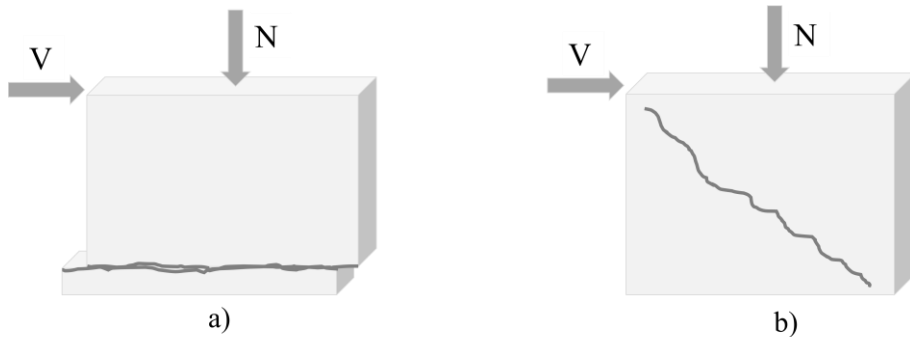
Scheme of shear failure mechanisms in masonry piers: a) sliding on a bed joint, b) diagonal cracking
